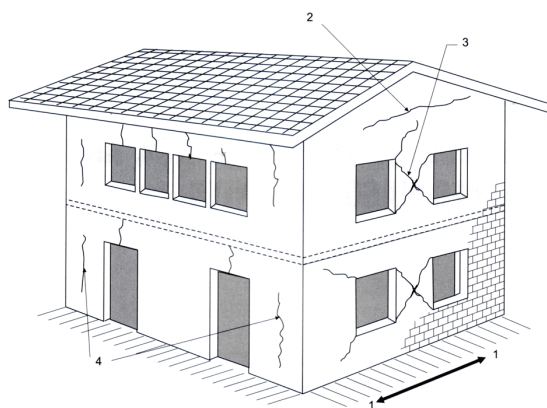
Typical Regions to be Inspected for Damage in Masonry Buildings
